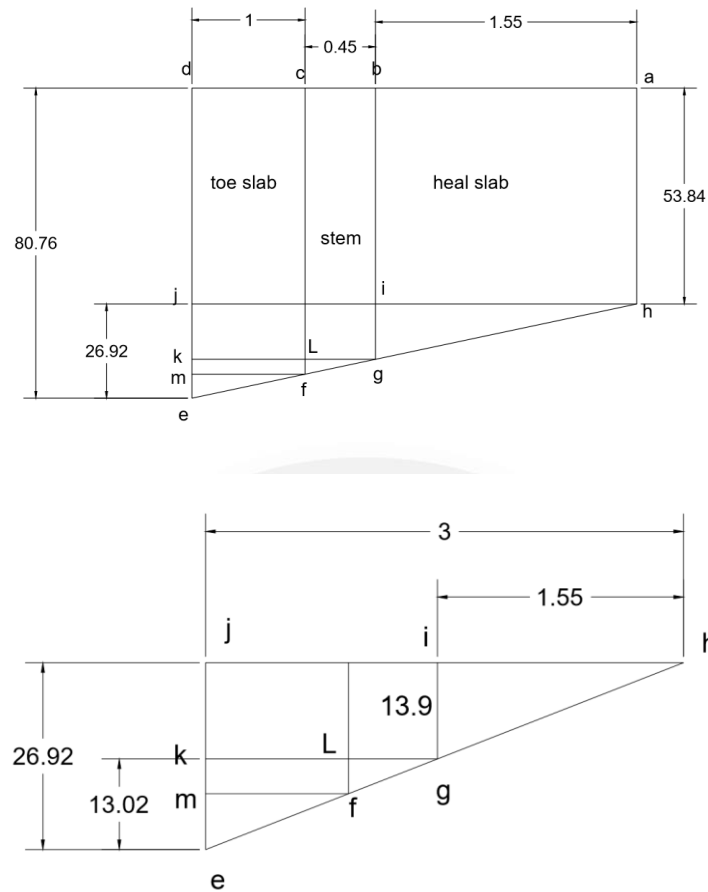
Cantilever retaining wall (Heal slab Top view)
